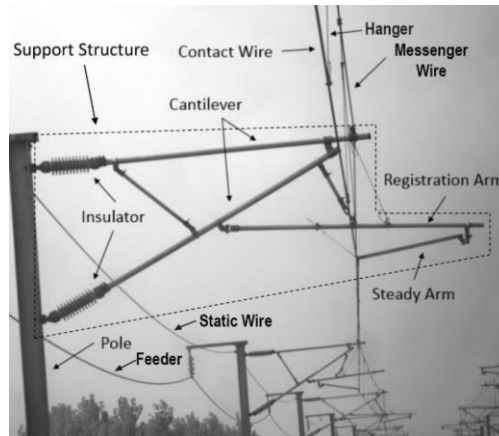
CONSTANT TENSION SUPPORT STRUCTURE
